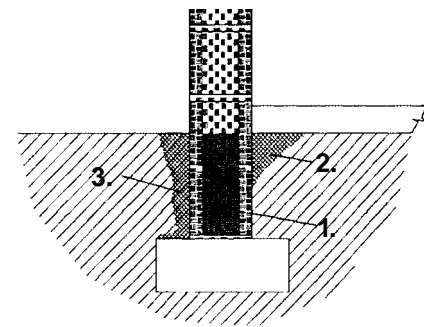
Completed treatment of block foundation—floating slab showing treatment of 1. the voids in the concrete blocks, 2. the soil in the subslab area at the expansion joint, and 3. the soil around the outside perimeter of the building.
